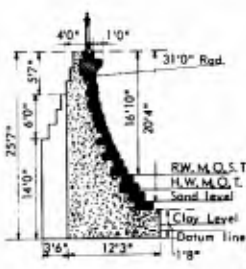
a. Beaconsfield Sea Wall, Bridlington (Mattews, 1934)
